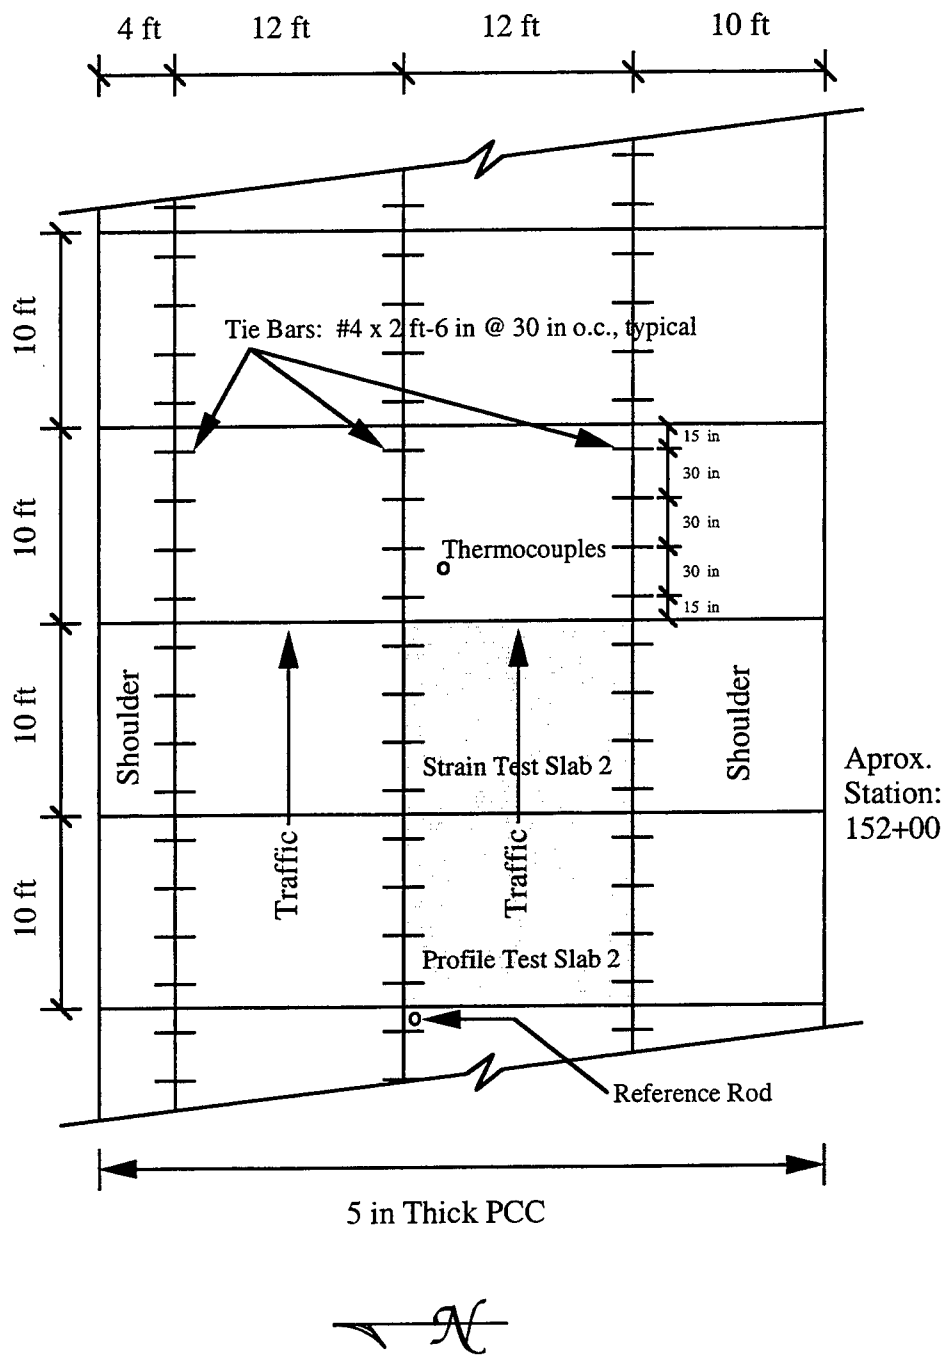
Test Slab 2 Layout for CDOT Project #2.
